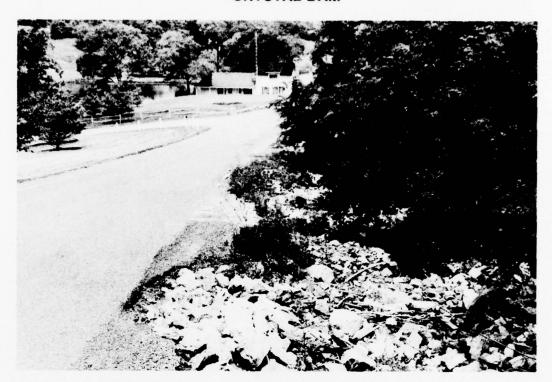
Looking Downstream at Emergency Spillway From Point in Line With Centerline Bearing
